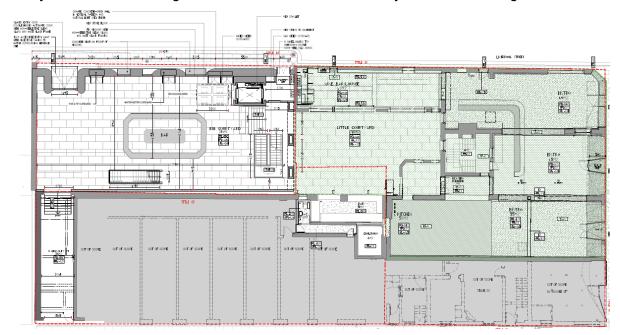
The internal layout of the hotel (source: application plans prepared by Point Architects)
